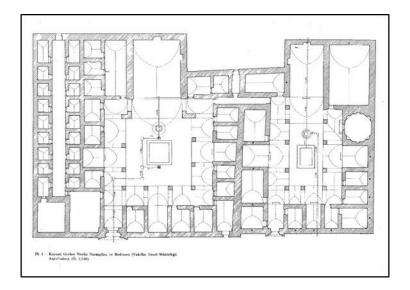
Gevher Nesibe Hospital plan, Cantay 1992, plan 2.
